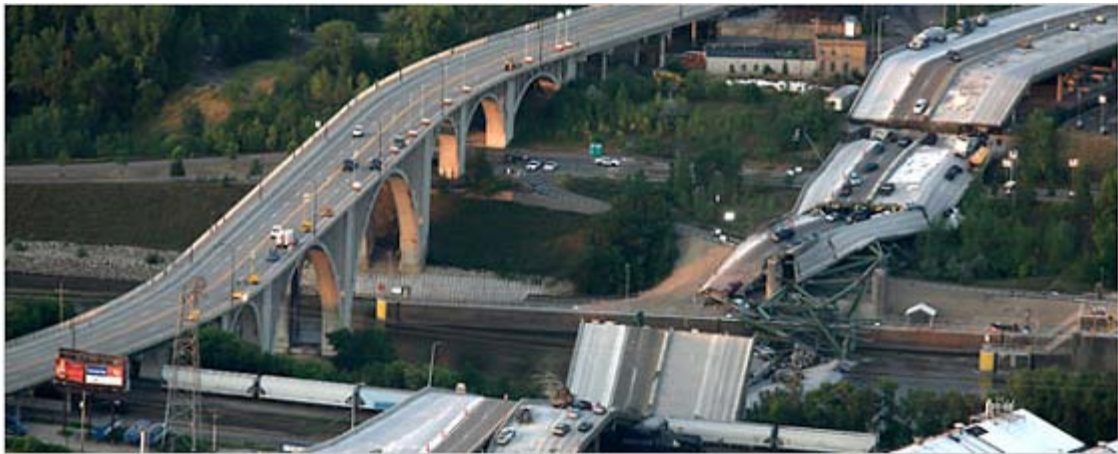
Collapse of I-35W truss bridge, Minnesota, USA
